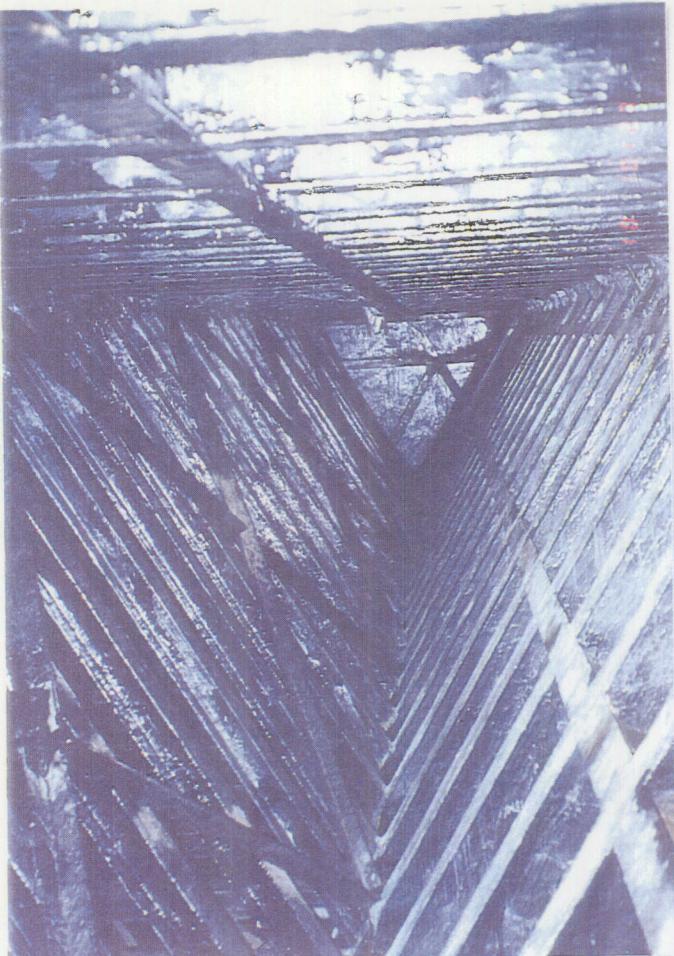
Morris Dam - 70' x 18' Drum Gates - Gate #3, View from right side of gate, looking 70' towards left side of gate. Top of photo are members for downstream face, left side of photo are the internal braces, right side of photo are structural members for bottom faceplate. - Sept 10, 1998.
